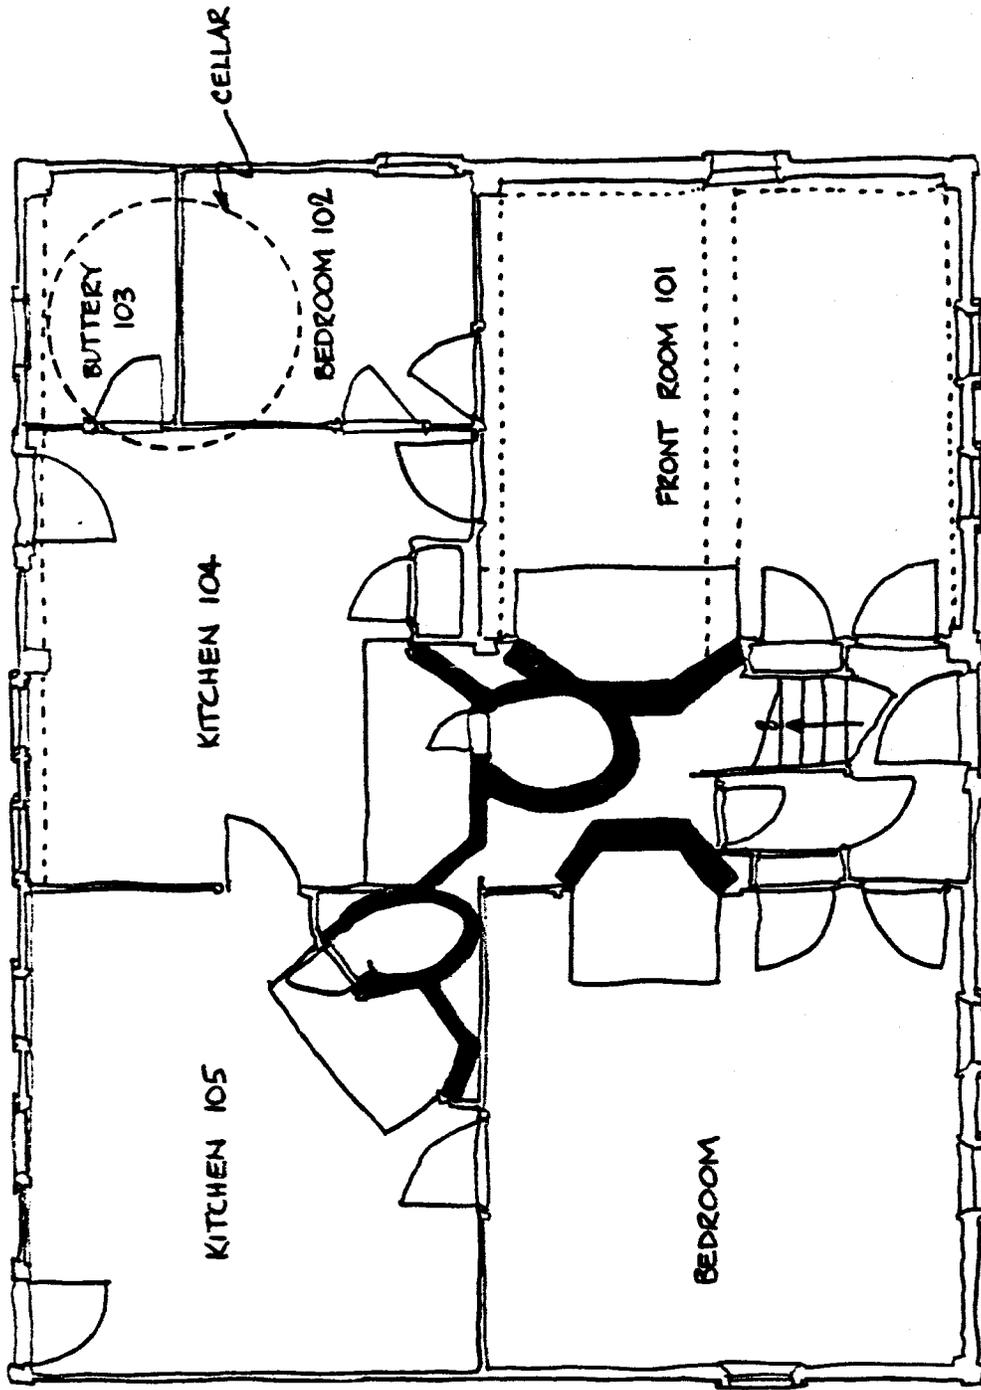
Atwood-Higgins House: Conjectural First-Floor Plan, c. 1800.
